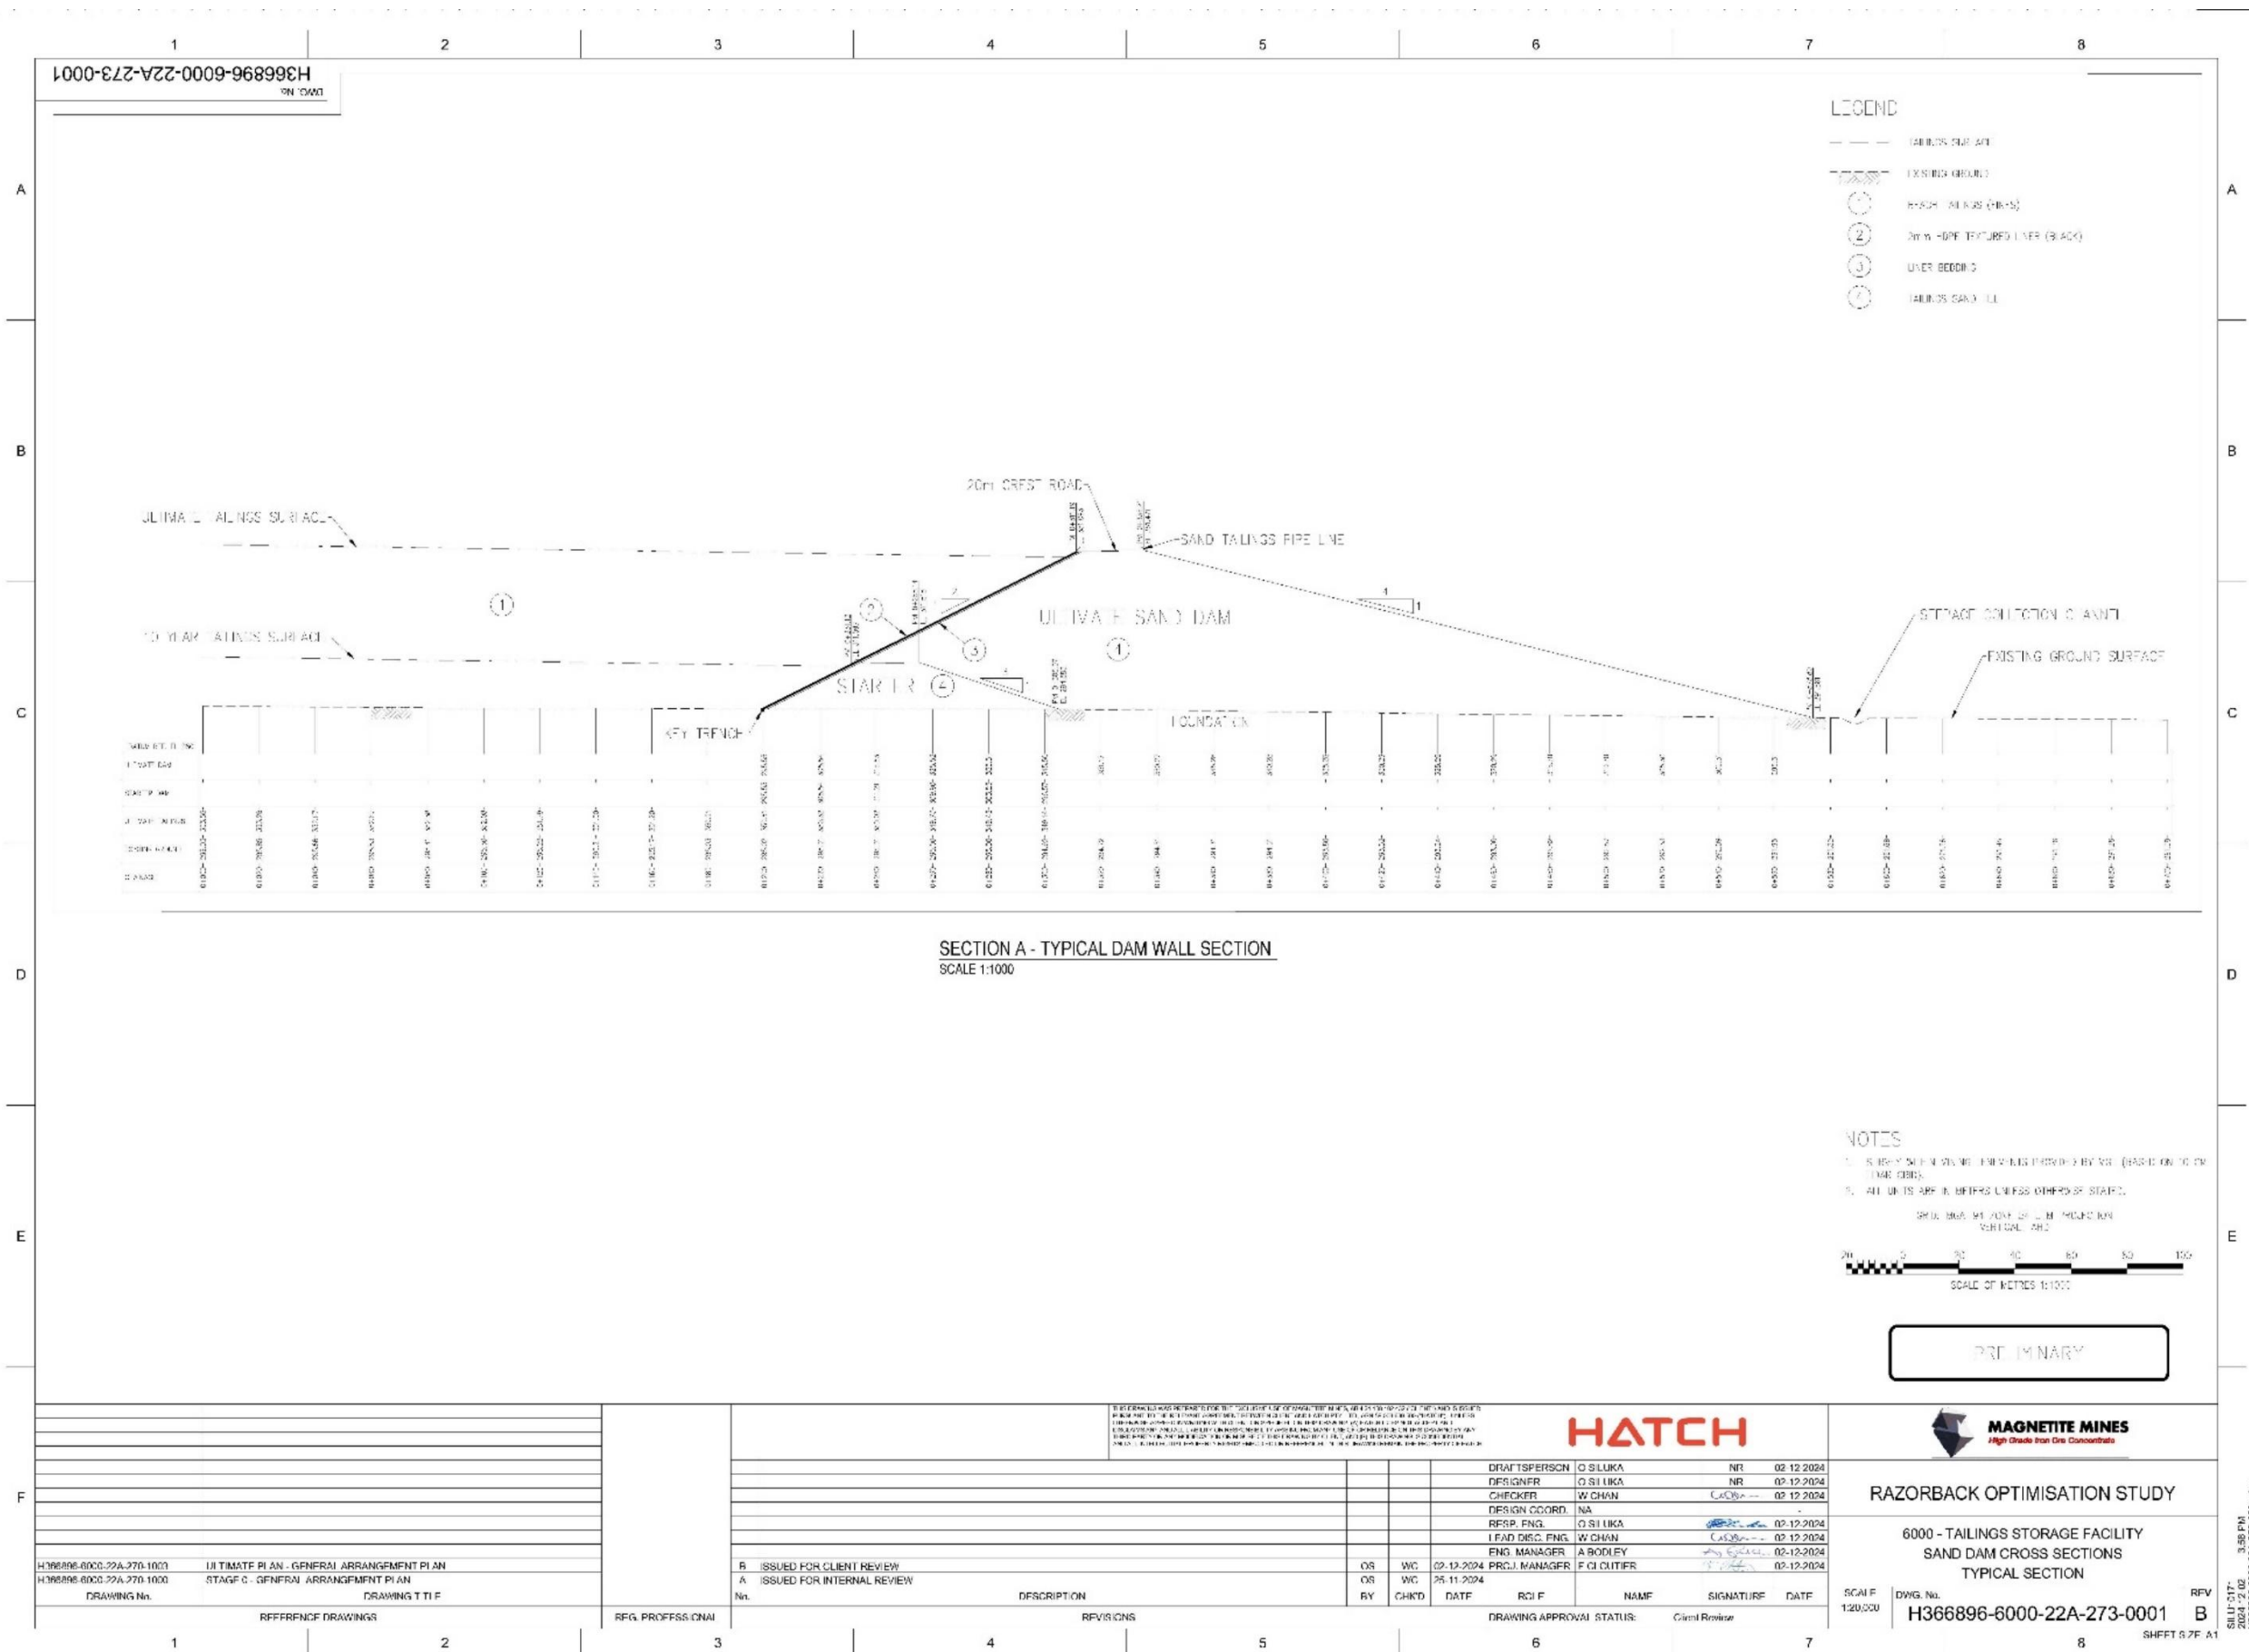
Typical TSF embankment cross-section (location in Figure 4-52)
